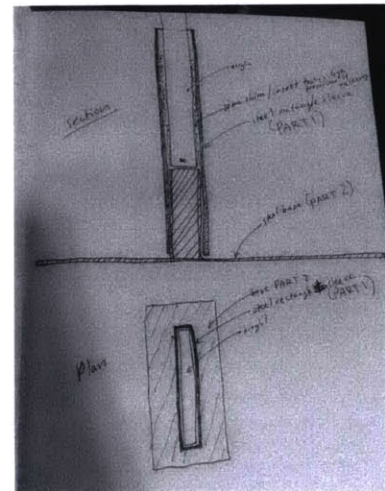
Early sketch of base construction. Acrylic is wrapped in steel. Fabrication section.
